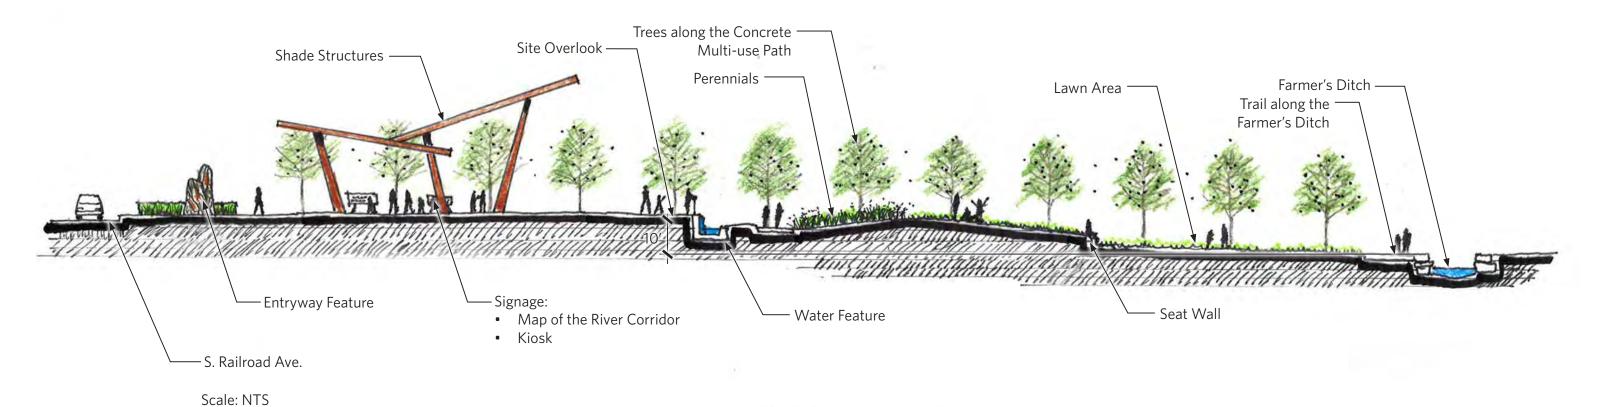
C. Section B: Old Loveland Waste Water Treatment Plant Site
